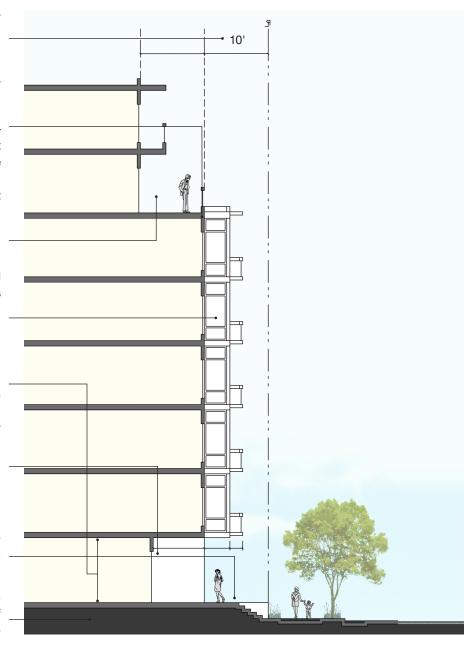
F. Low-rise – Mixed-Use Residential District
